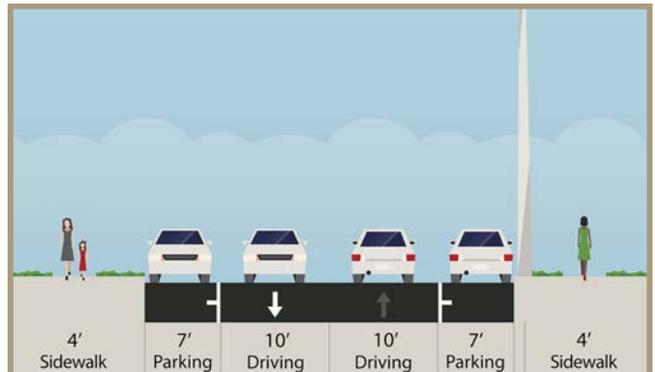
Looking east on Fourth Avenue between Cedar Street and Gallows Hill Road, existing conditions.
